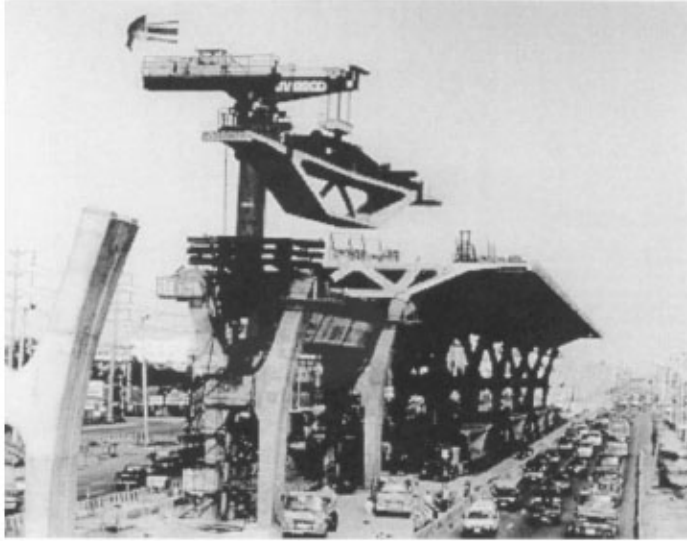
Bang Na Expressway, Thailand — launching of girder erection.
